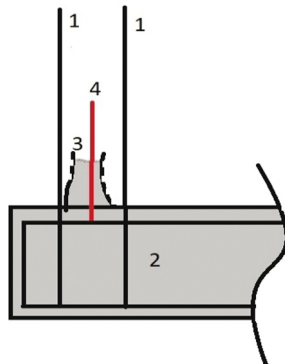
Scheme of the lifting assembly for the rubber strip. 1 – reinforcement bars, 2 – reinforced concrete slab, 3 – mounting lift obtained with flexible steel mesh and filled with concrete, 4 – rubber tape (WCS sealing element), own elaboration
